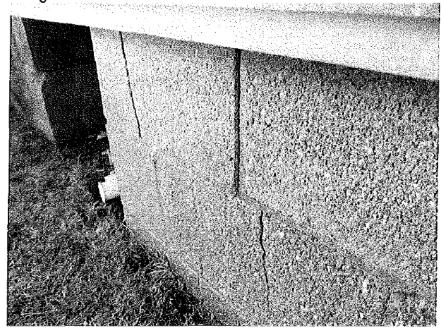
View of cracks in the foundation wall on the east side of the building.
